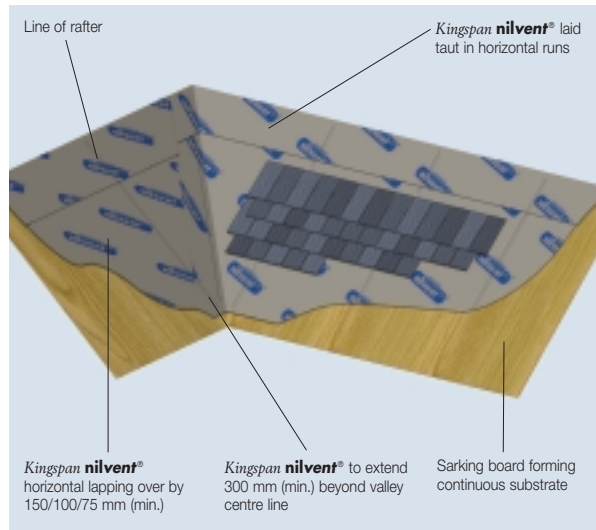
Valleys – Fully Supported Horizontal Installation with Natural Slates
